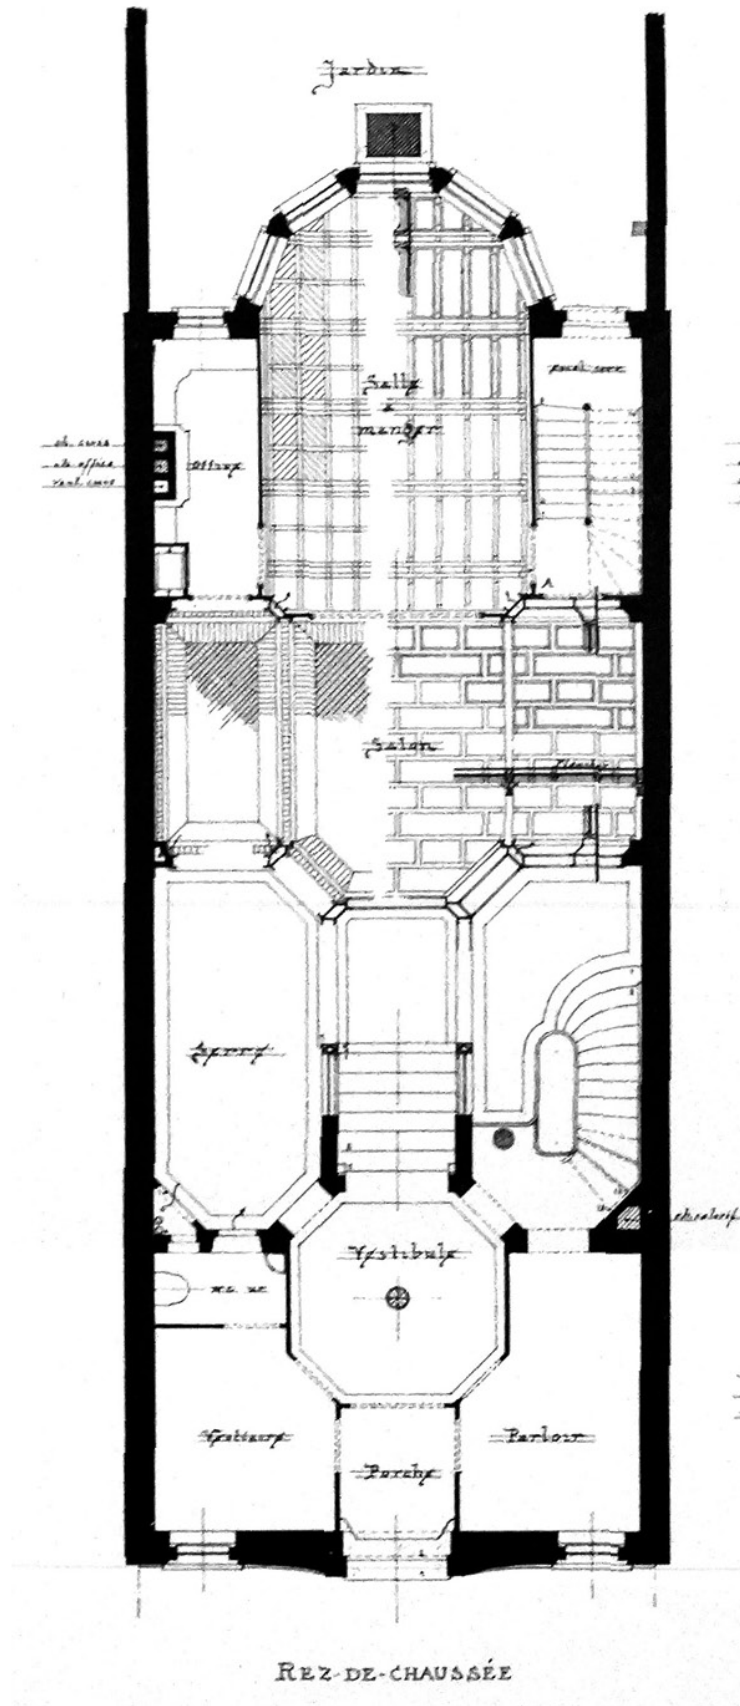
Hôtel Tassel, plan of the main floor from *L'Émulation*, 1895, plate 39 [Canadian Centre for Architecture] 369
